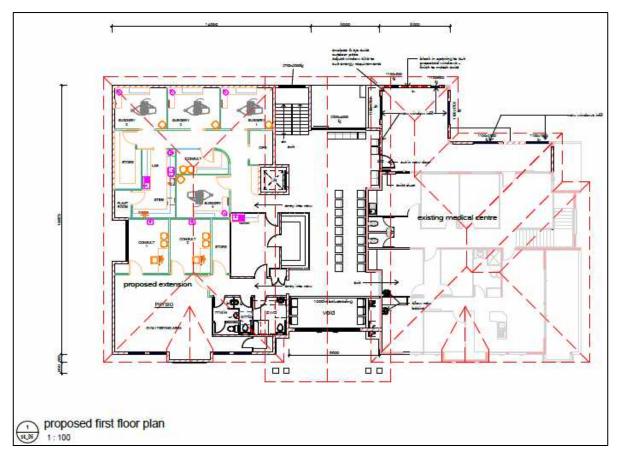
Internal Layout Plan (Source: Concepts Building Design)
